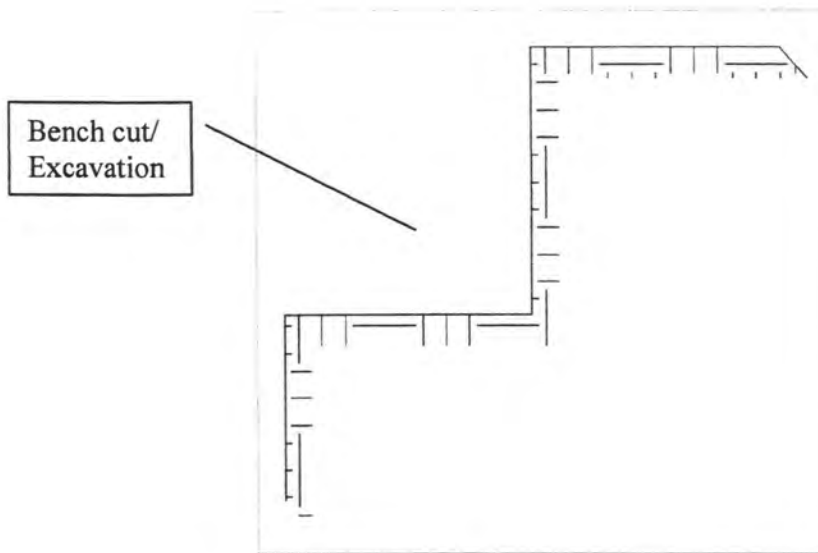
Picture showing step 1 of the construction process of Soil Nail wall
